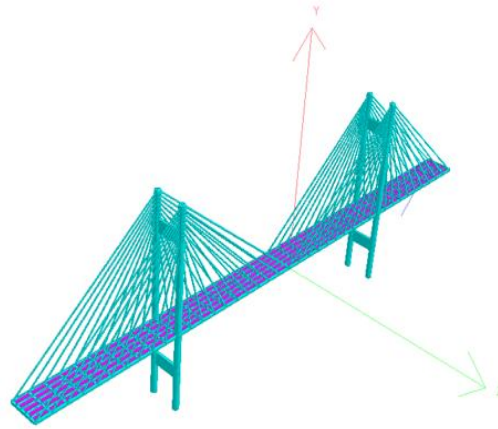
H- Shaped Pylon Cable-Stayed Bridge
